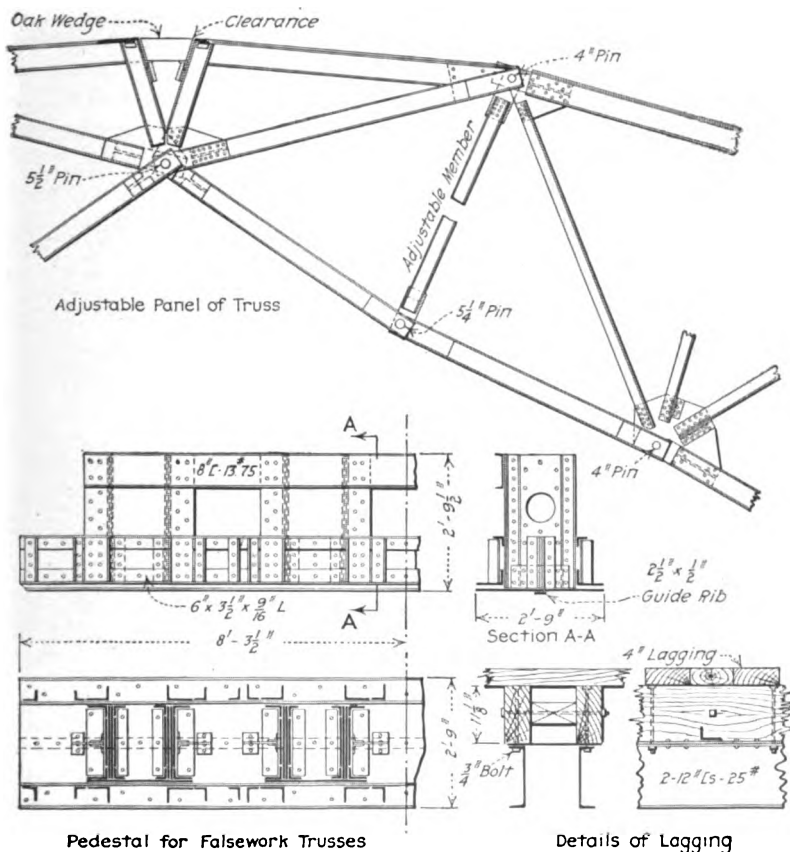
Tunkhannock viaduct. Details of adjustable panels of centers
